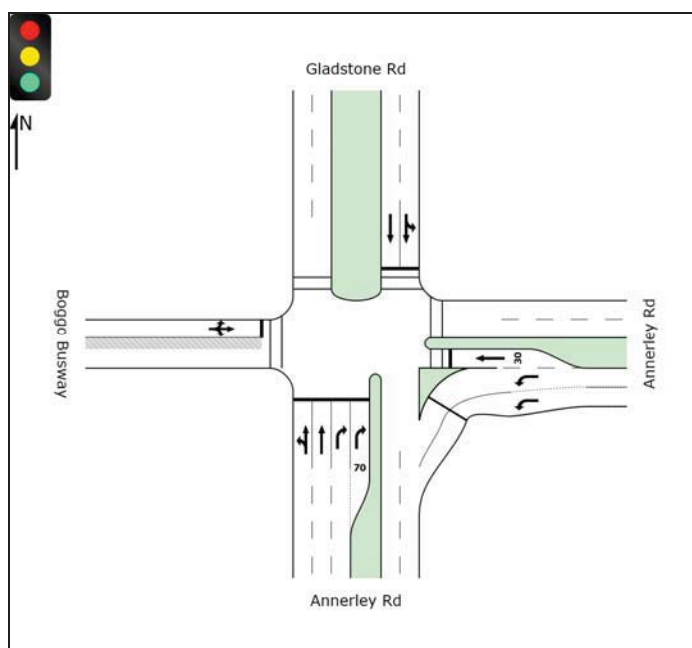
Annerley Road/Gladstone Road/Boggo Busway
